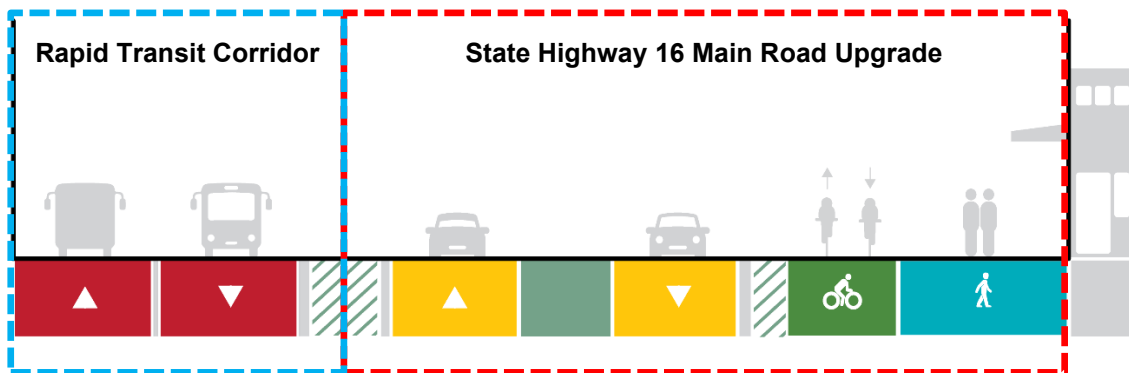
Indicative future SH16 Main Road Upgrade cross sections
